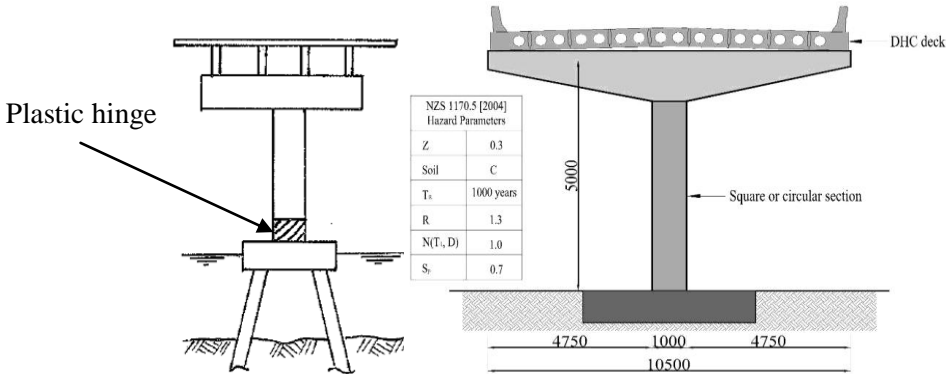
Prototype bridge support; (left) plastic hinge location; (right) front elevation
